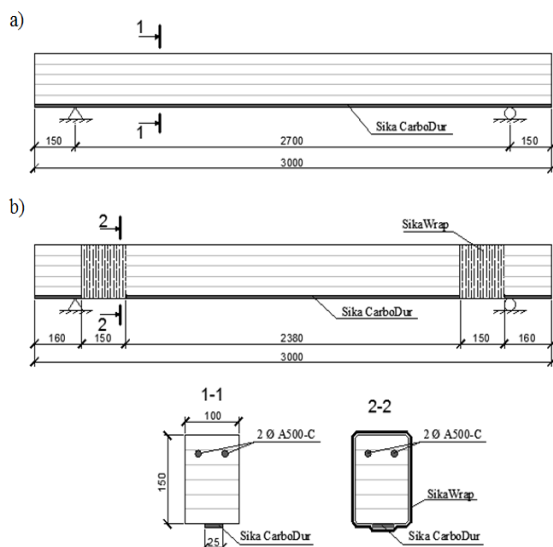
Scheme of reinforcement of beams from glued wood with steel and composite reinforcement: a) without additional anchoring of composite tape; b) with additional anchoring of the tape
